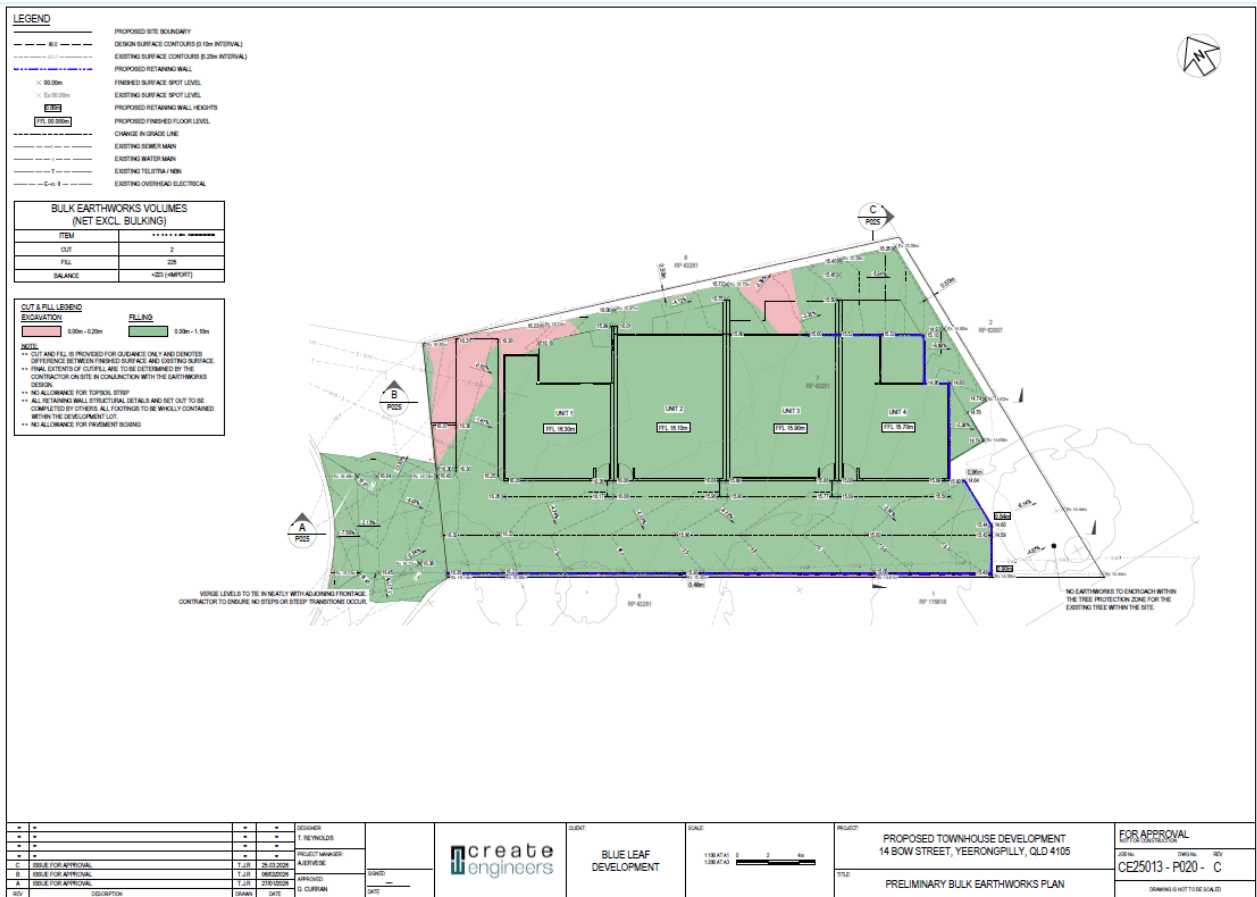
Revised Preliminary Bulk Earthworks Plan (Create Engineers, 2026)
